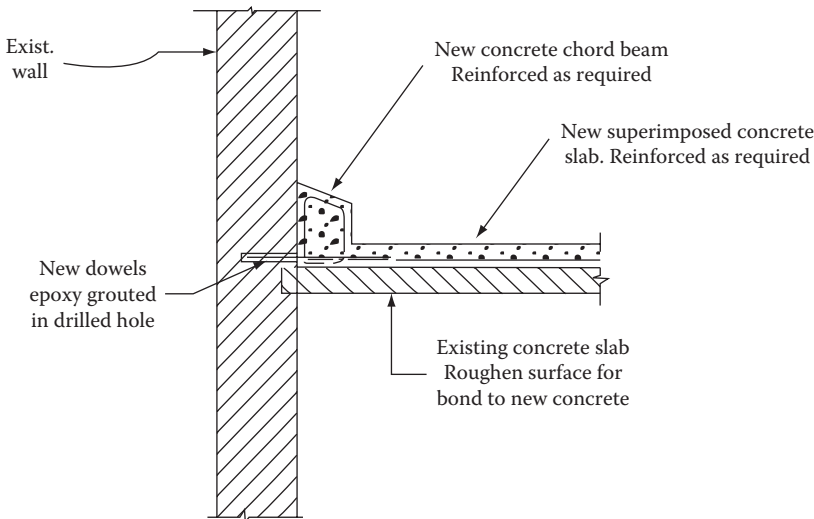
Superimposed diaphragm slab at an existing concrete wall.
